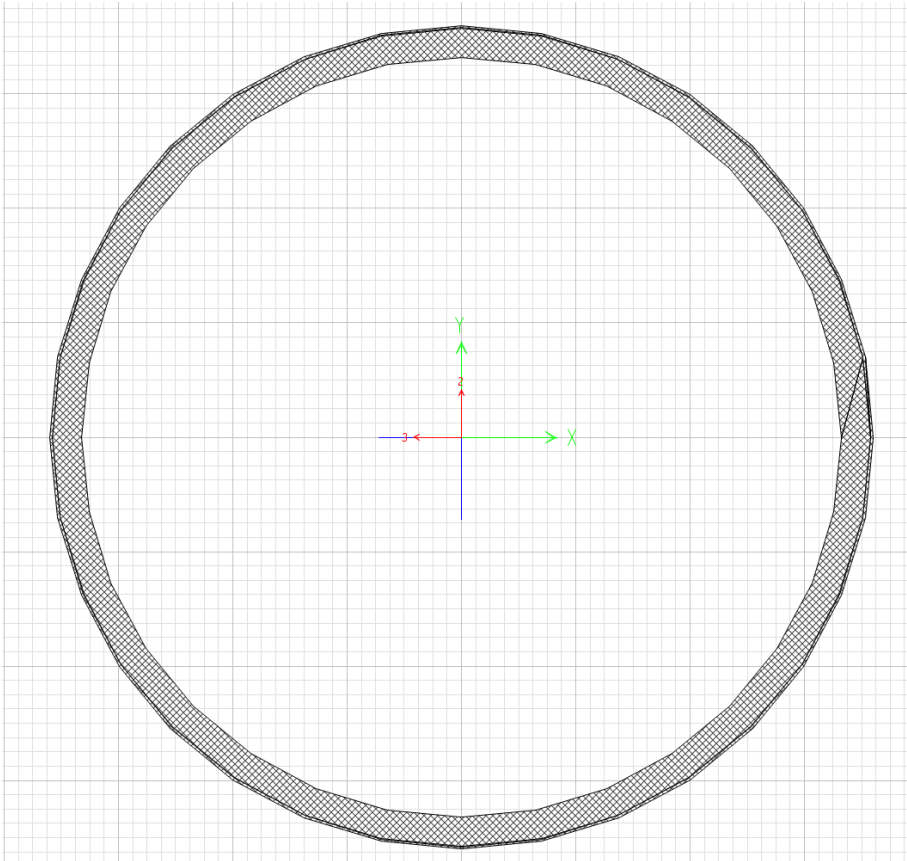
Steel caps (thin layer on the outside of the member) surrounding the tubular member
